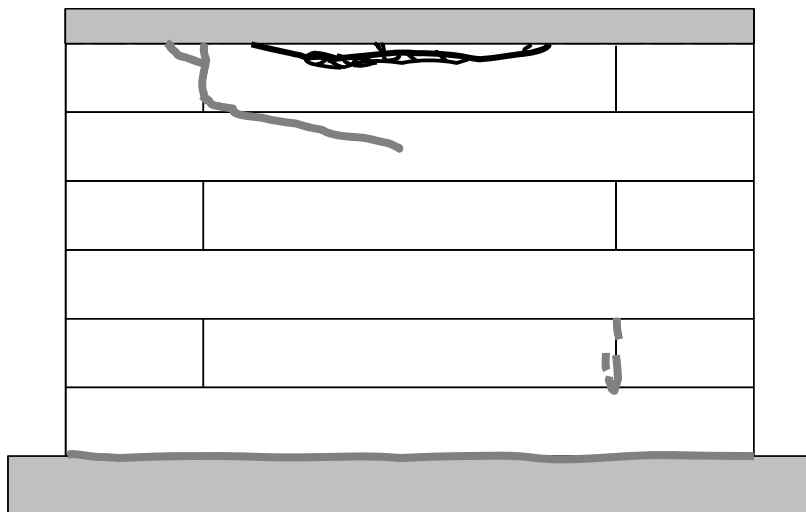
Cracking of specimen at Cycle 12a (tensile bond beam crack)
